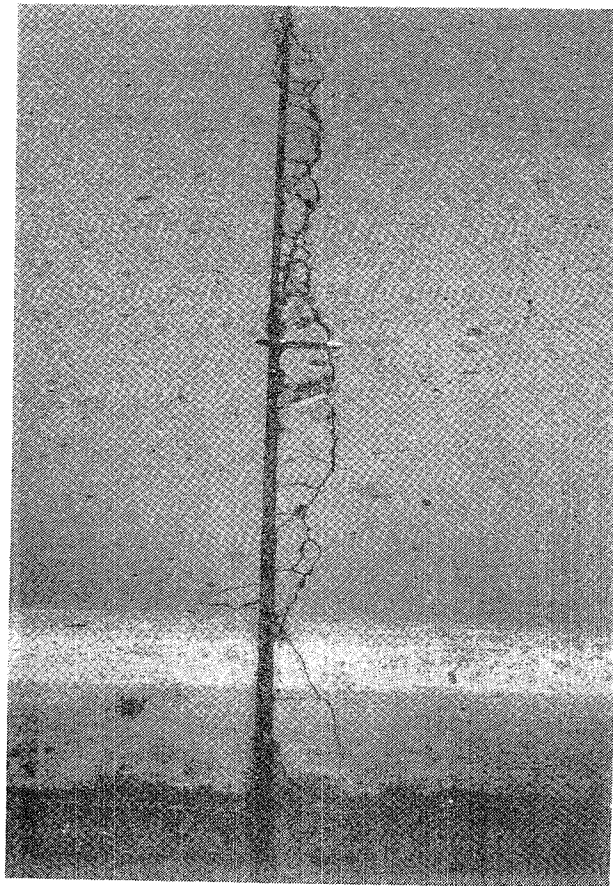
Illustration of joint spall rated as "severe" on a jointed reinforced concrete pavement (JRCP-16-NY).
